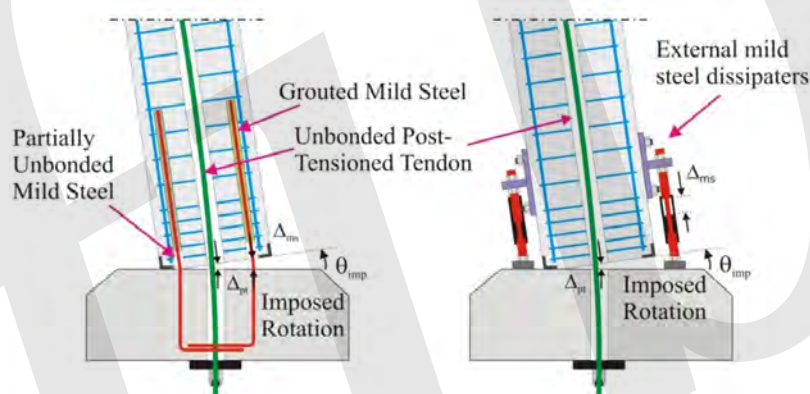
Progression from internal mild steel bars to external "Plug and Play" dissipaters (courtesy of Marriott, S. Pampanin, A. Palermo, 2007, "Seismic Design, Experimental Response, and Numerical Modelling of Rocking Bridge Piers with Hybrid Post Tensioned Connections". University of Canterbury Report, ISSN-0110-3326 (2007-01) NZ.
